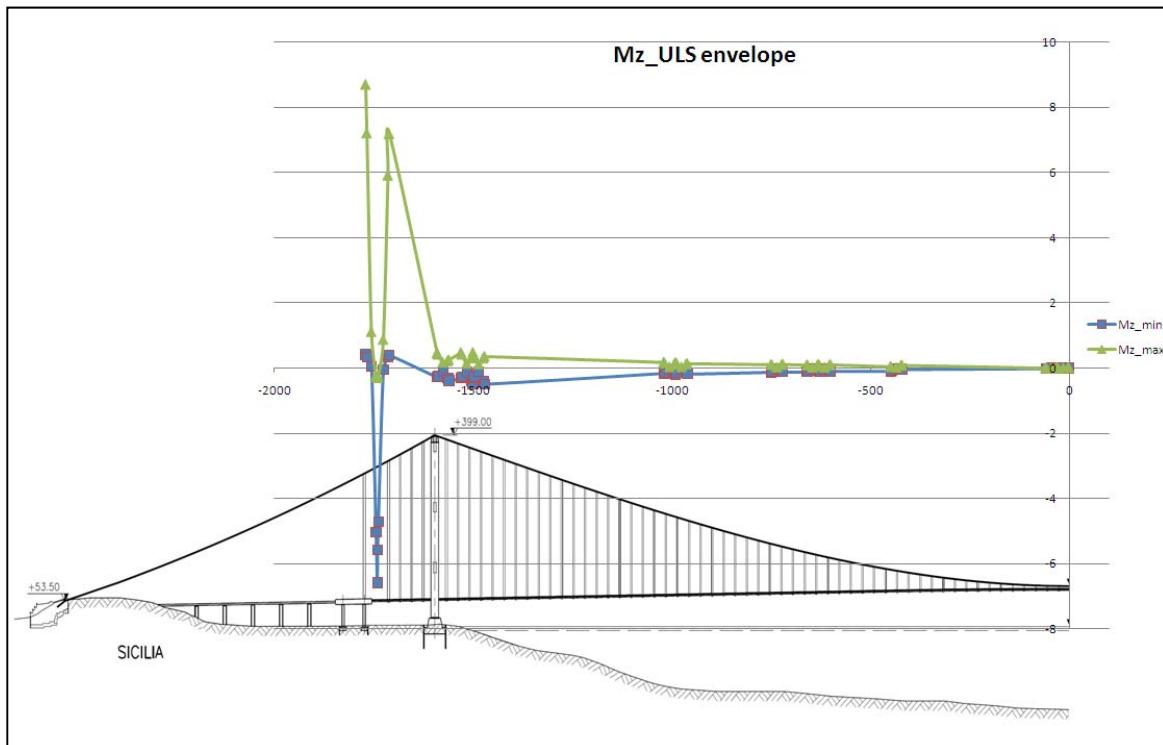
Sectional forces in rail girder for rupture of hanger 3, Moment (MNm)
